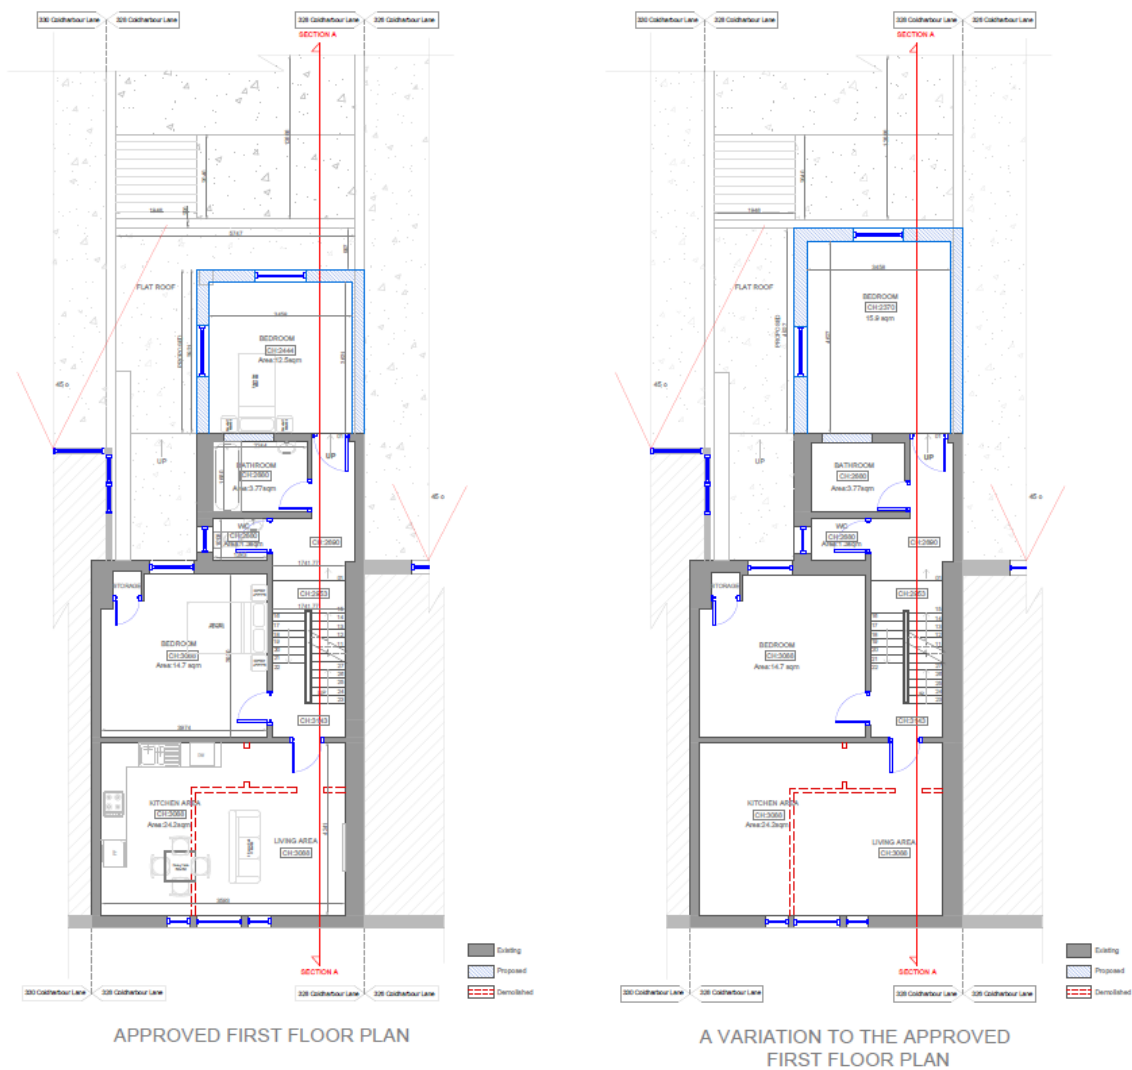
Proposed first floor plan illustrating the previously approved and proposed new extension to the existing rear addition.
